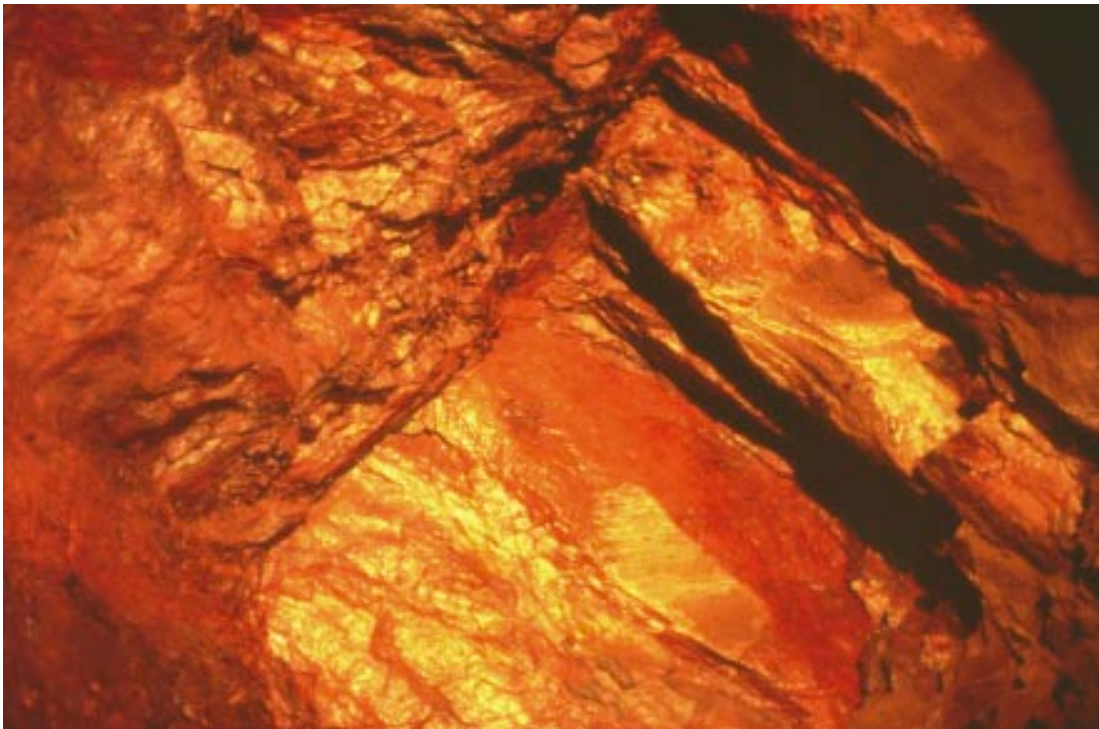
Overbreak of some metres starts to develop in section 2/545 in the Singö deformation zone, Forsmark 3 tunnel.
